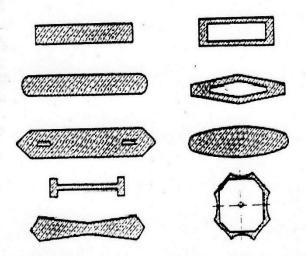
Typical cross-section shapes of piers for river and waterway crossings.
